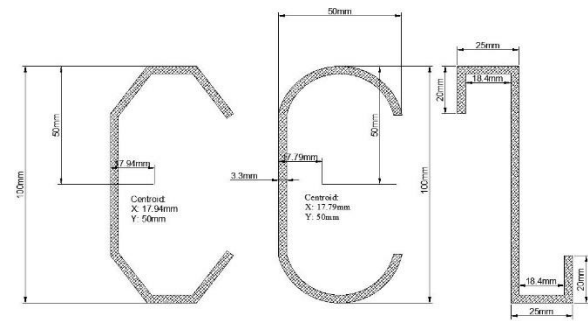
2D drawing of (a) Folded Section (b) C-Section (c) Z-Section
